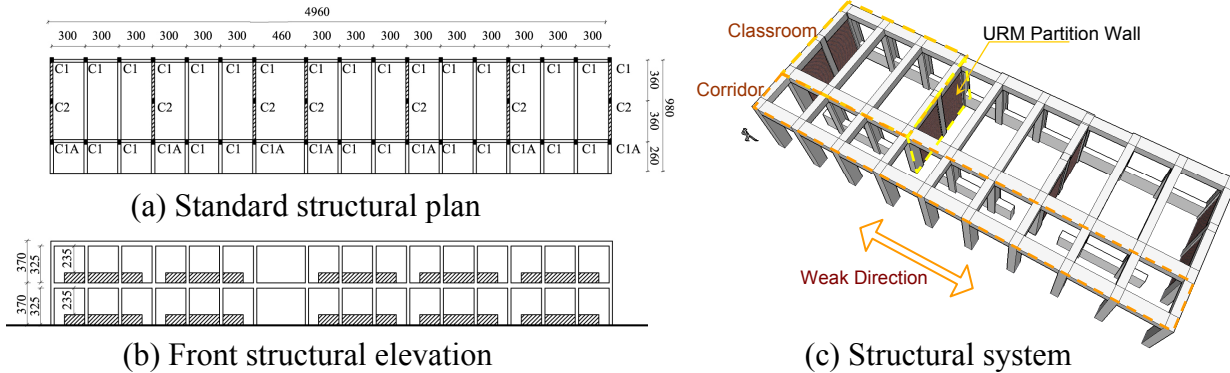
Structural plan, elevation, and system of typical school buildings in Taiwan
